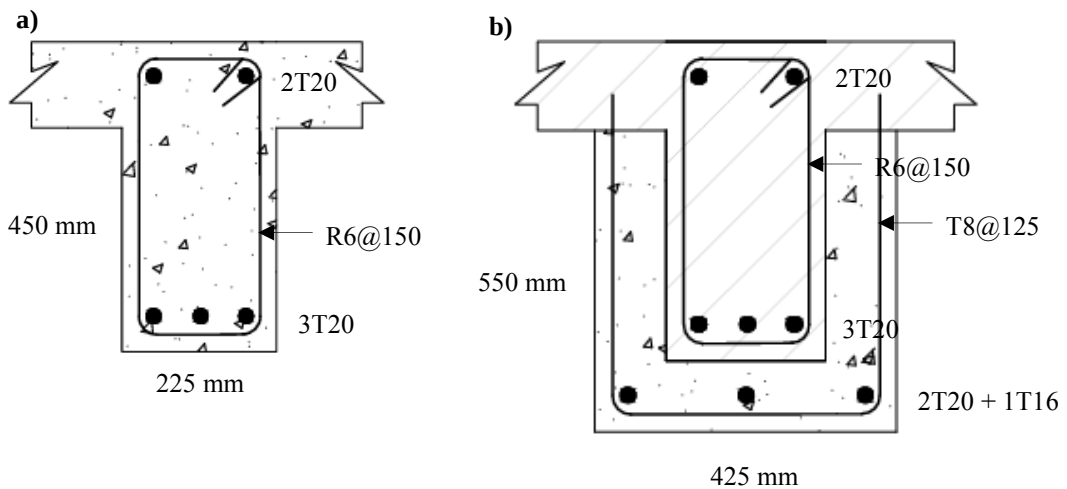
Section sizes and reinforcement details (a) defective beam, (b) retrofitted beam
